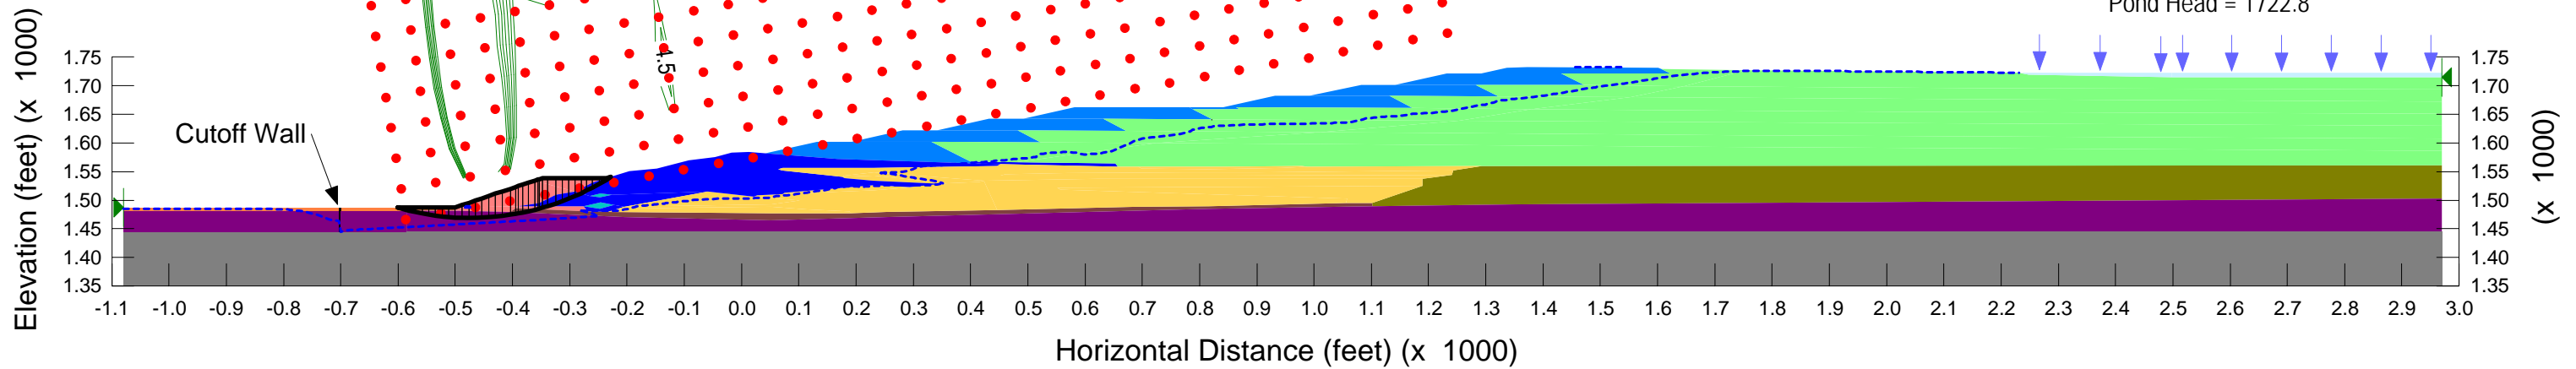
Fully Liquefied Section F - Cell 2W Lift 8: Cutoff Wall - Drainage System Idle (LIQ)
